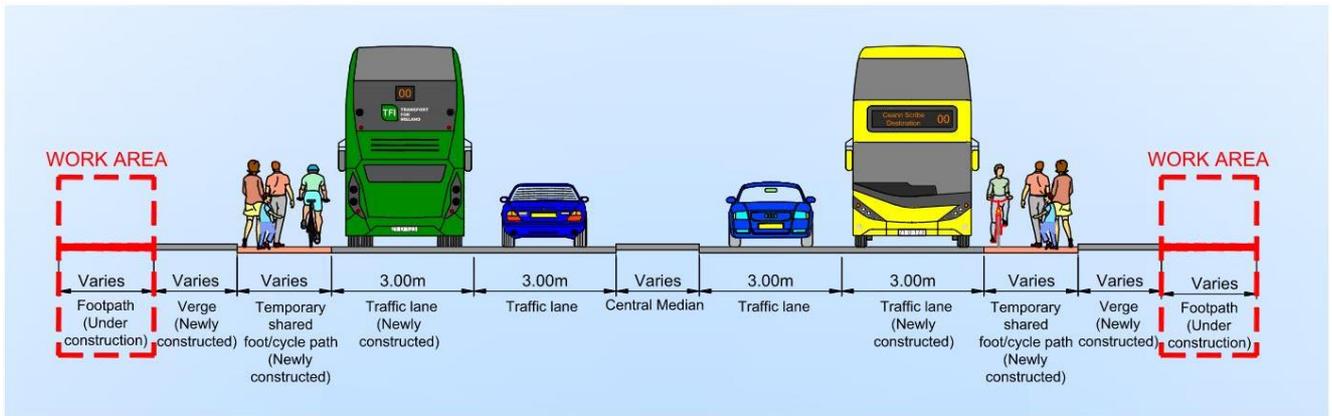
Traffic Management Cross Section, Section 5, Section 6 and Section 7a – Stage 1
